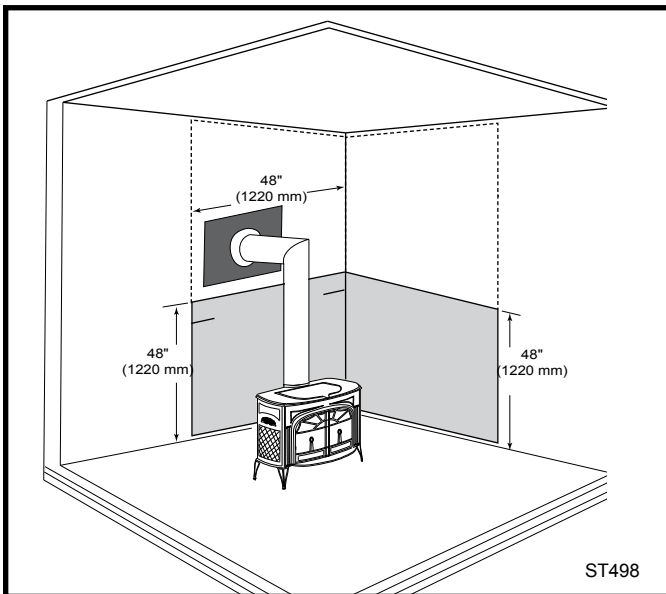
Parallel installation with rear wall pass-through, two wall shields. Reduced clearances to both rear and side walls. Wall shields may meet at corner if desired. Wall pass-through must comply with codes. Refer to "Special Installations."
